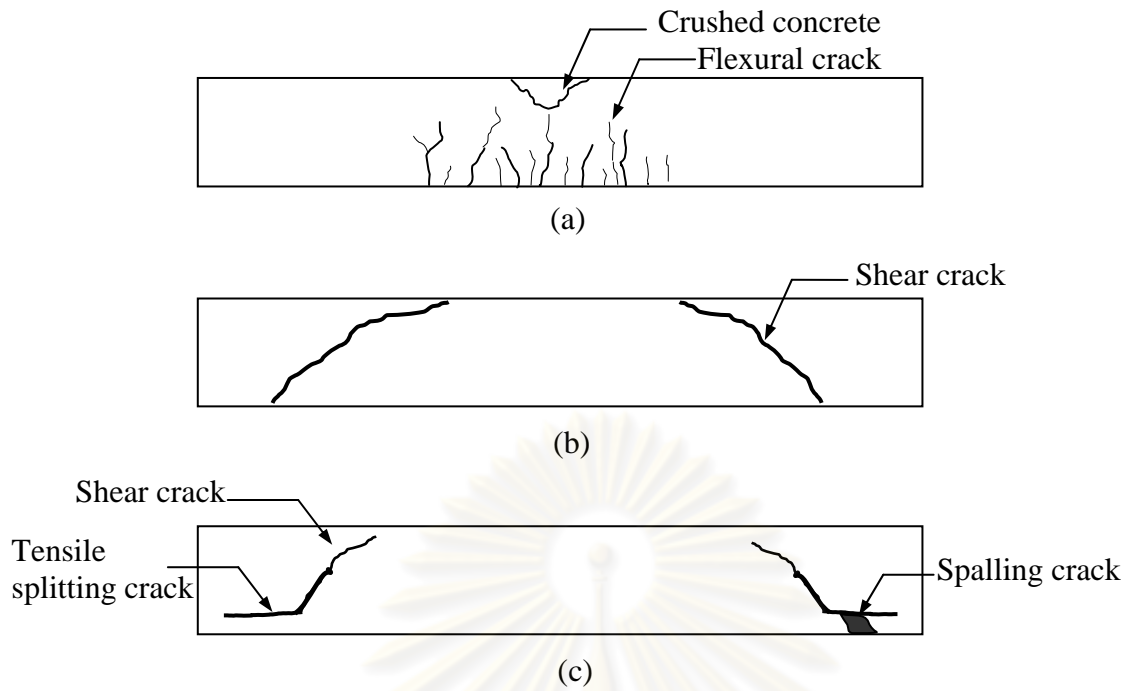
Different types of failure: (a) flexural failure; (b) shear failure; and (c) shear failure with tensile spitting cracks
